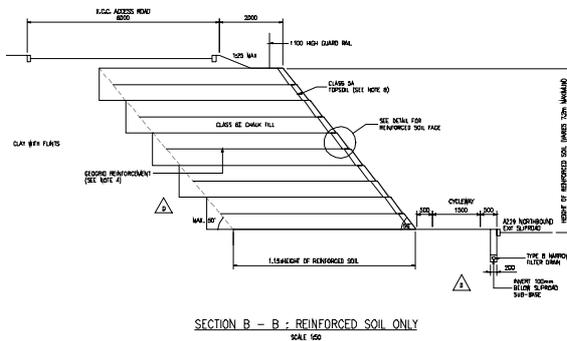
Section of Reinforced Slope : S46 - Lord Lees
